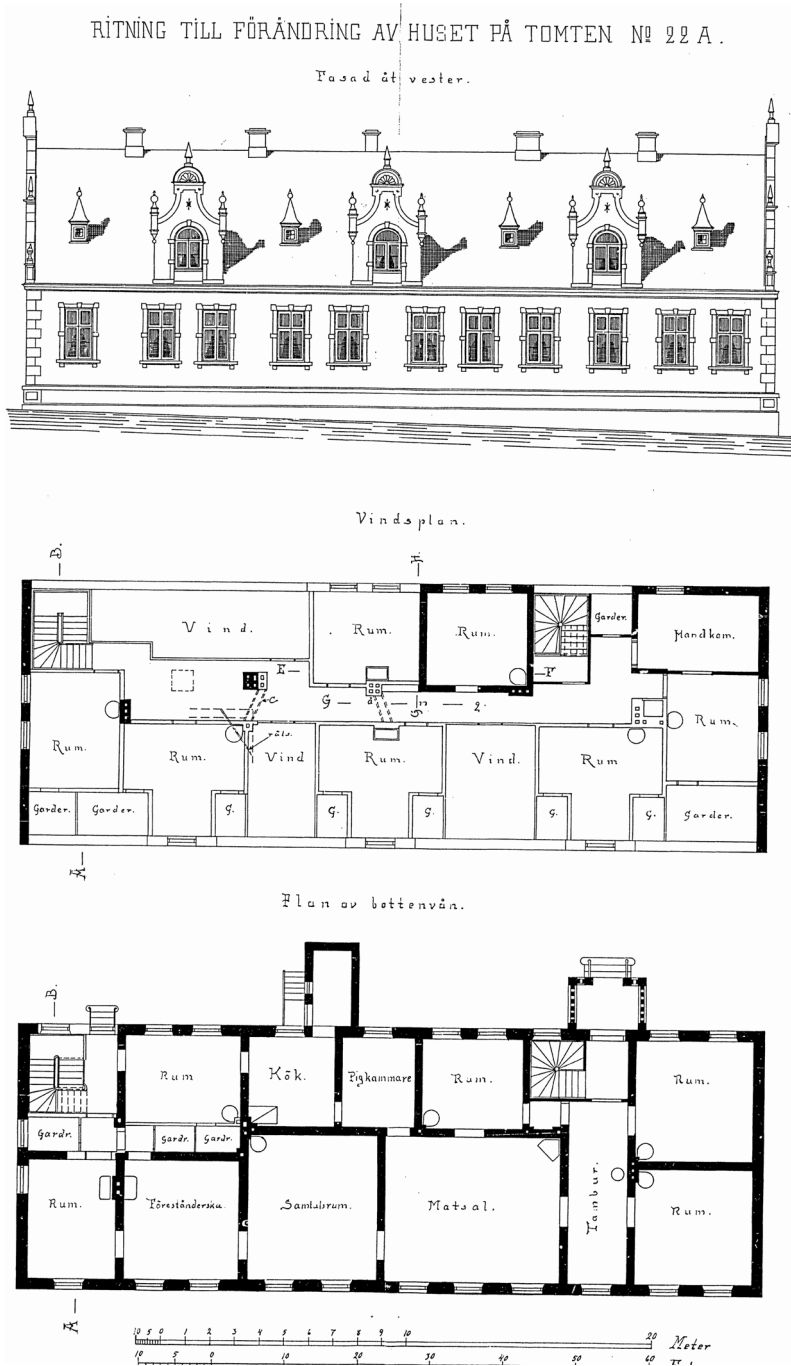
Plan of Thomanders Student Home in Lund, 1895. With common rooms (*samlingsrum*, *matsal*), the housekeeper's room (*förestånderska*), and the maid's room (*pigkammare*) on the ground floor. Image from the original planning application (Lund City Archive)
